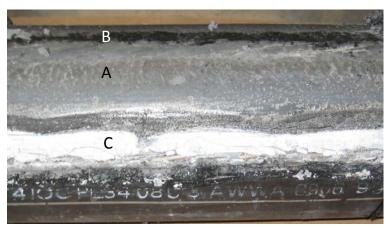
Photo. Longitudinal section of a tendon section with types 1–3 grout identified. (22)
